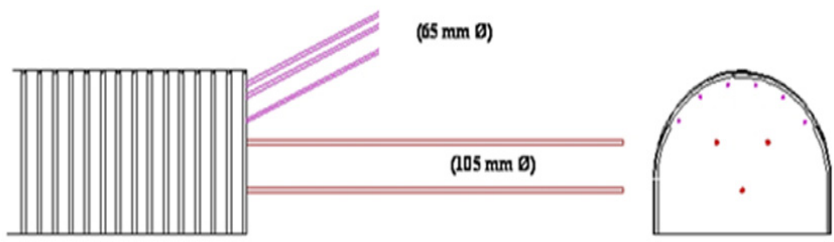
Description of boreholes where the gas-pressure-measurement tube is inserted in order to carry out the measurements.
